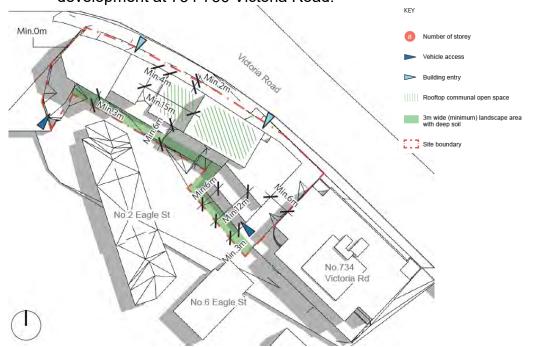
Built form strategy prepared by Council – Building setbacks and separation
